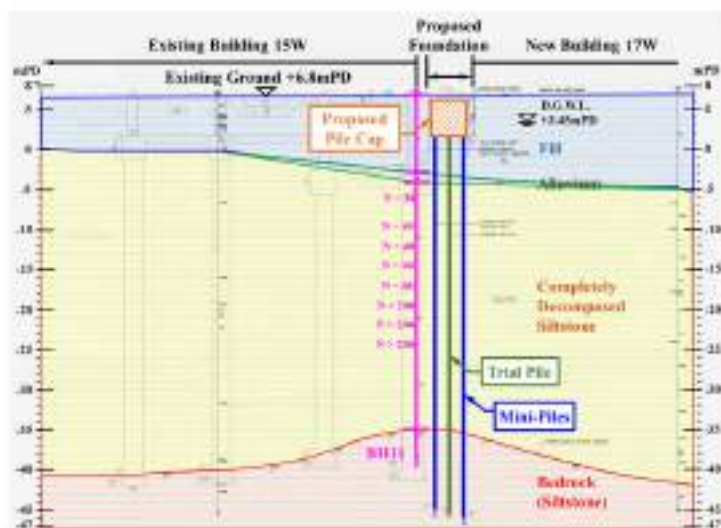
Geological Profile of Proposed Foundation (along Section A-A of Plate 3)
